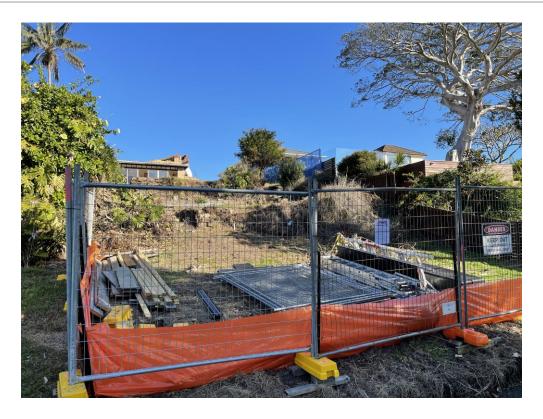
View of the adjoining site at No 86 Quirk Street with new dwelling under construction, looking south from Bushey Place
